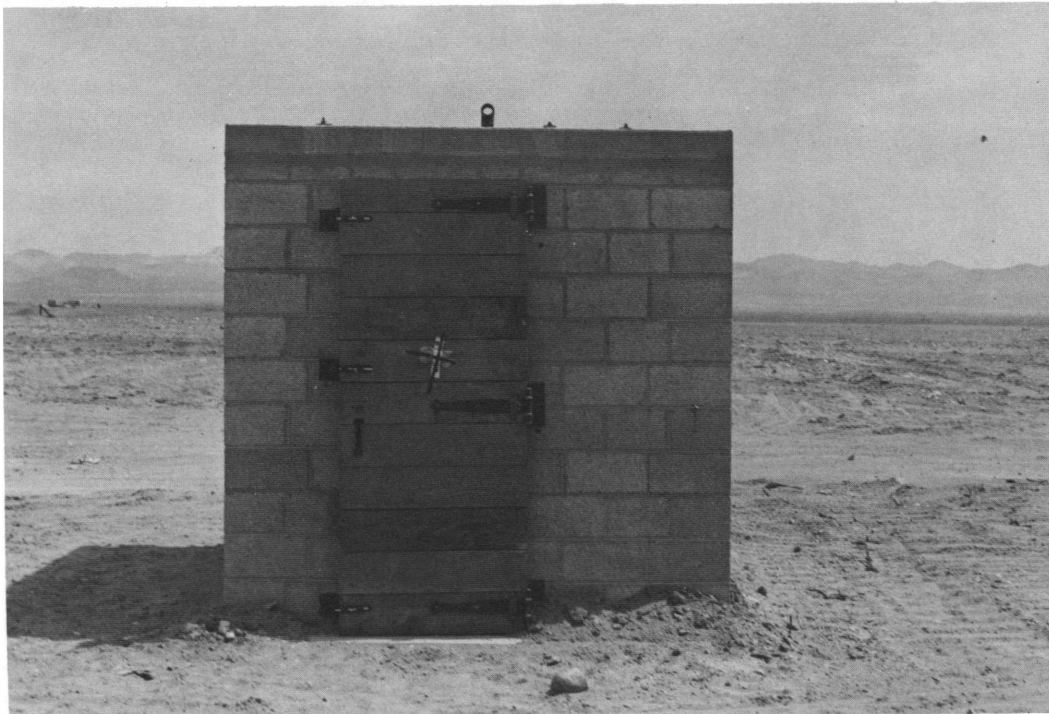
Exterior of masonry utility-type shelter, stations 1–34.1 g, j, and m.
